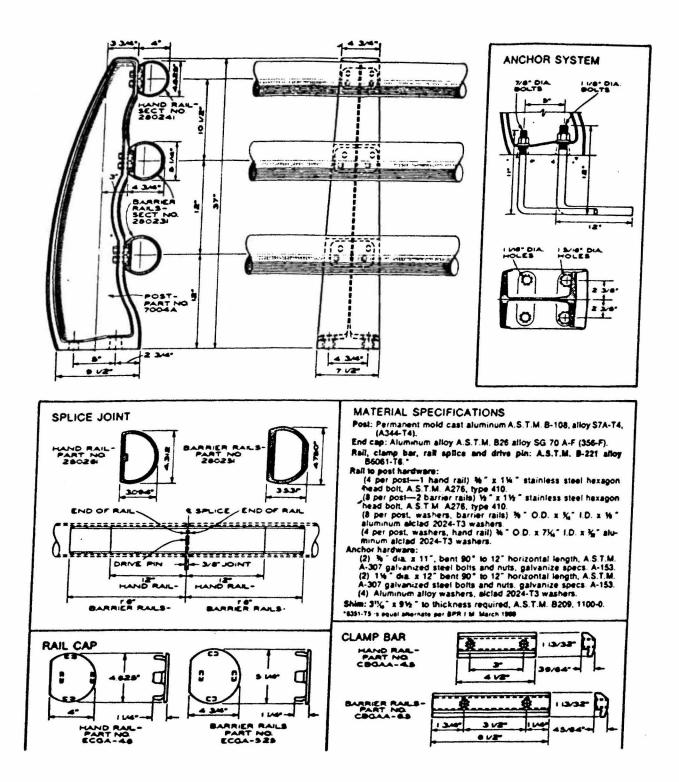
Aluminum Tri-Rail bridge rail with sidewalk.
